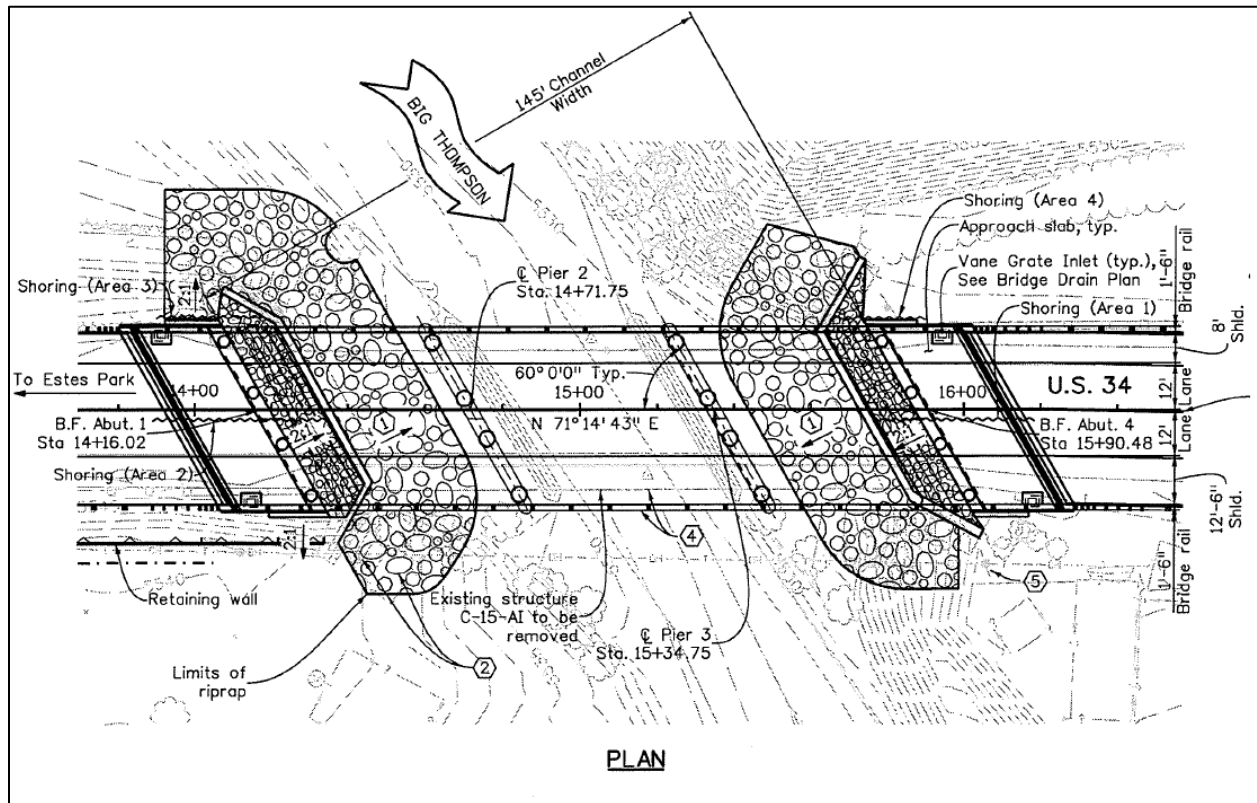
Plan view of the bridge deck of C-15- AN (CDOT see Appendix A)
